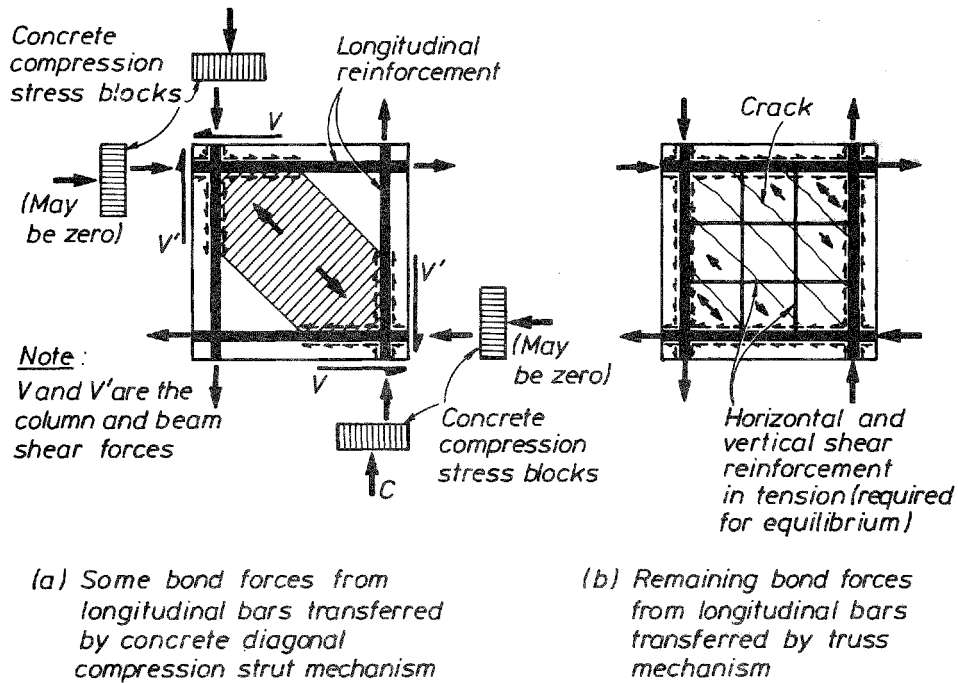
Transfer of Bond Forces from Longitudinal Beam and Column Reinforcement Across a Beam-Interior Column Joint Core
